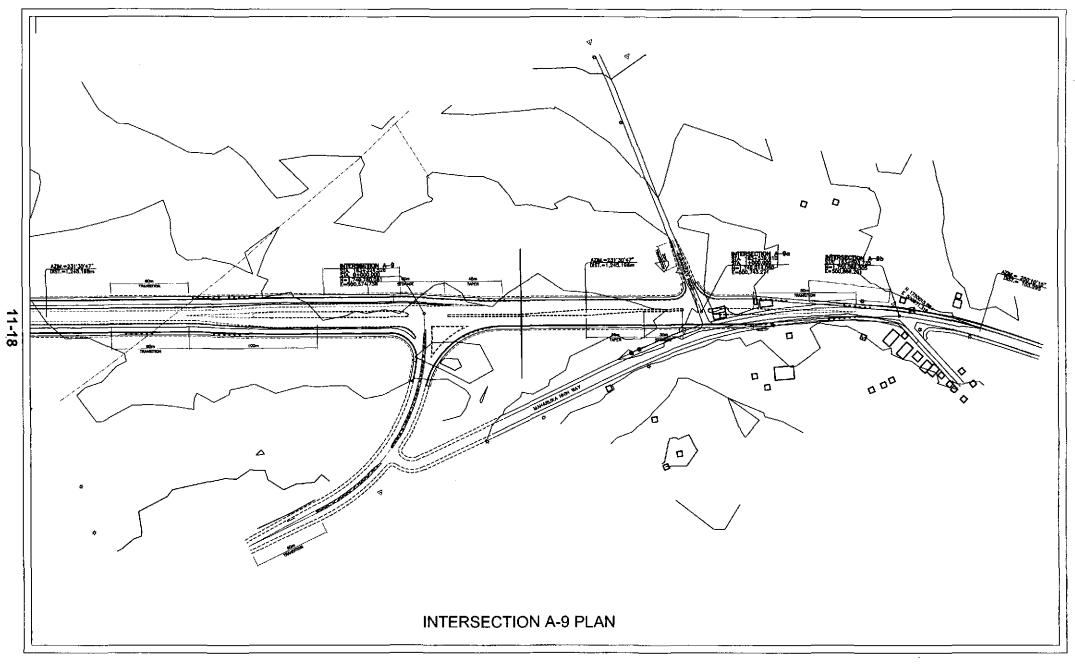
PLAN OF RECOMMENDED SCHEME
